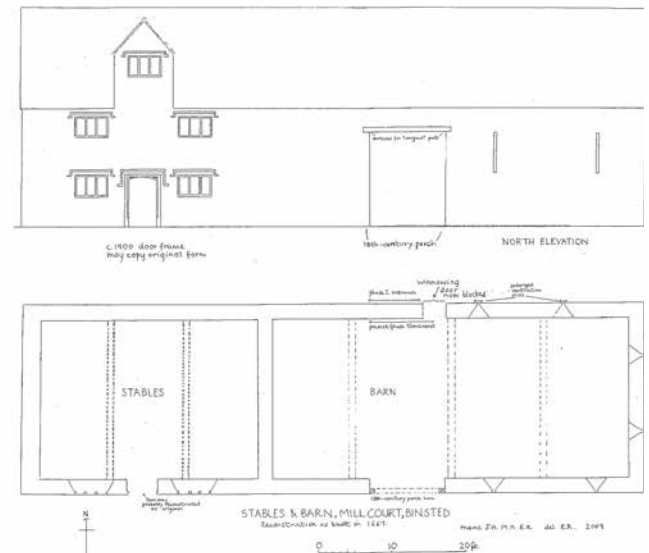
Barn and stables at Mill Court, Binsted. North elevation and plan of the barn and stables as built in 1667.
